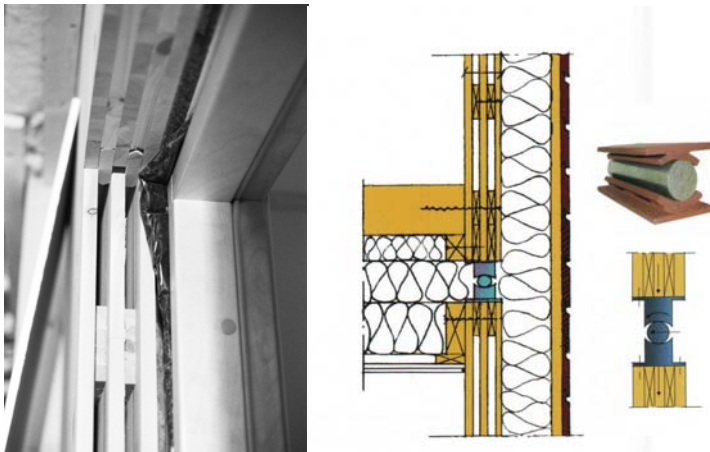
Cross-section of the wall structure during construction and a vertical section of an exterior wall with a flank transmission damper in steel.
